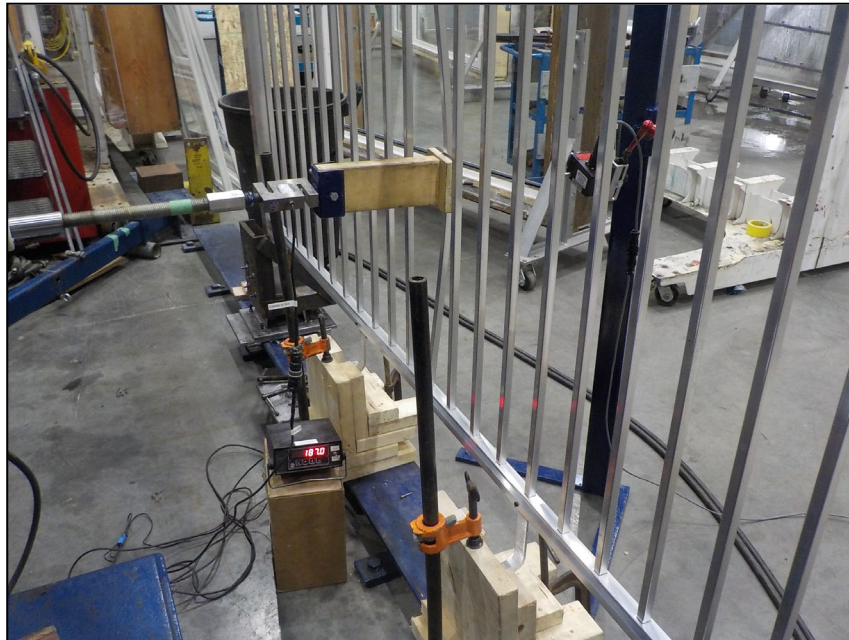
Century Welded Fascia: In-fill Load Test
